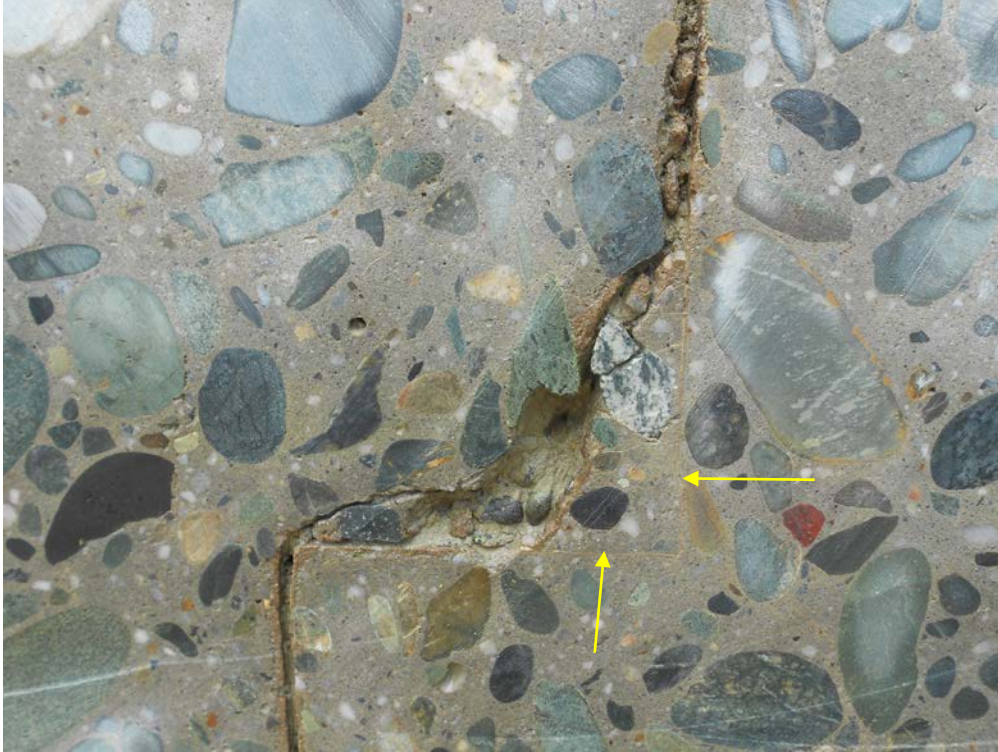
Shear Key with Tight Bond (Arrows) and Typical Cracking
